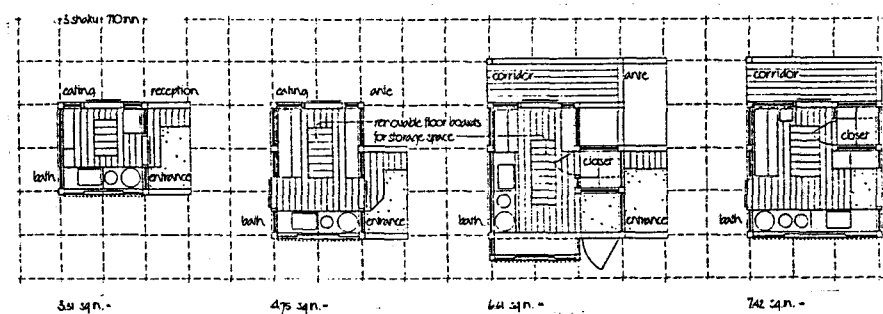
Standard plan types of kitchen (Engel, 1964: 241)
